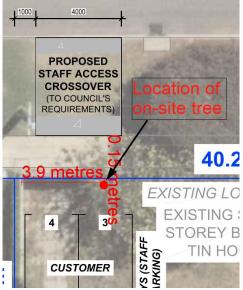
Location of existing on-site tree in relation to the proposed driveway and car bays
